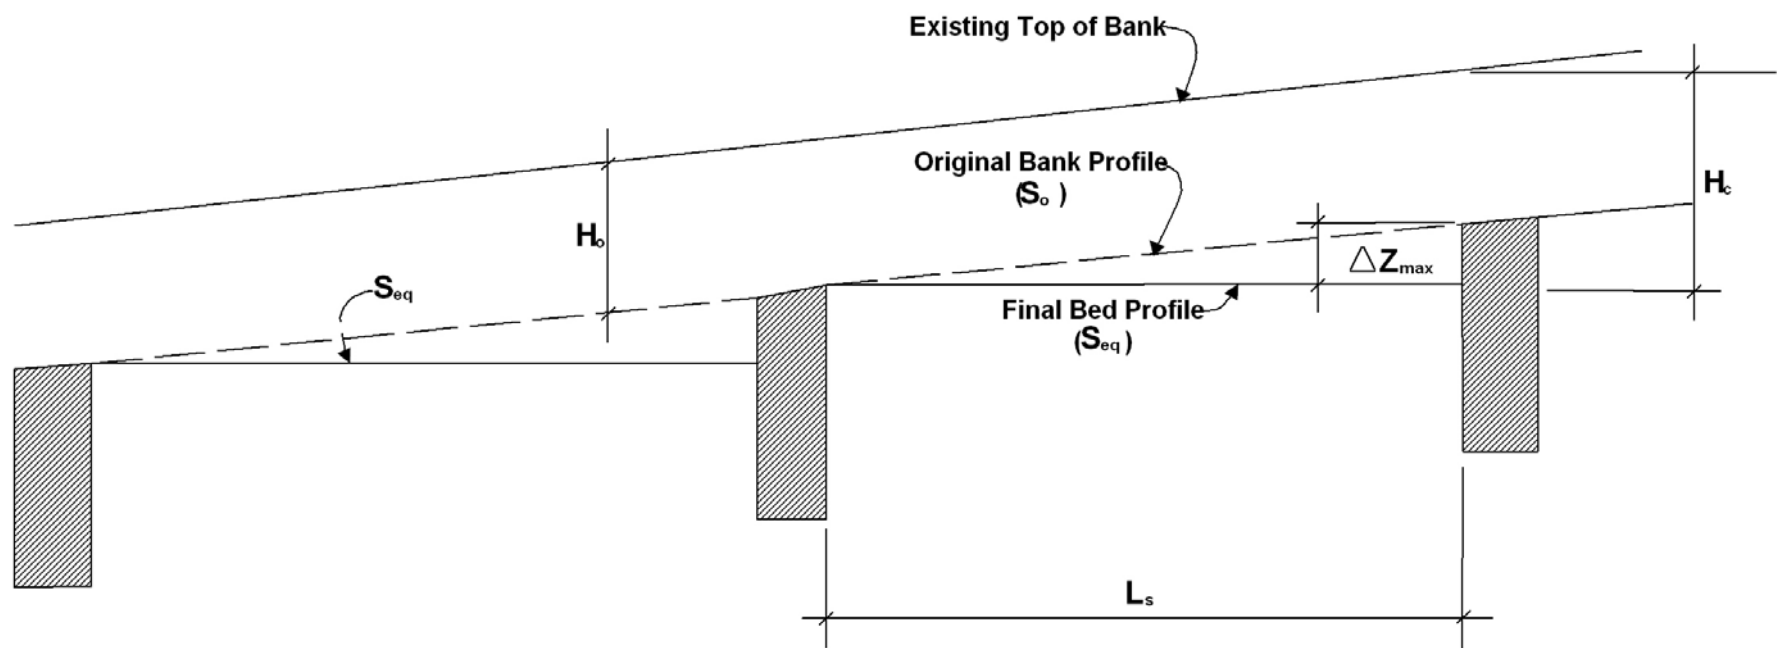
Illustration of method for determining the spacing of grade-control structures based on equilibrium slope (S_{eq}) concept and maximum stable (critical) bank height (H_c).
